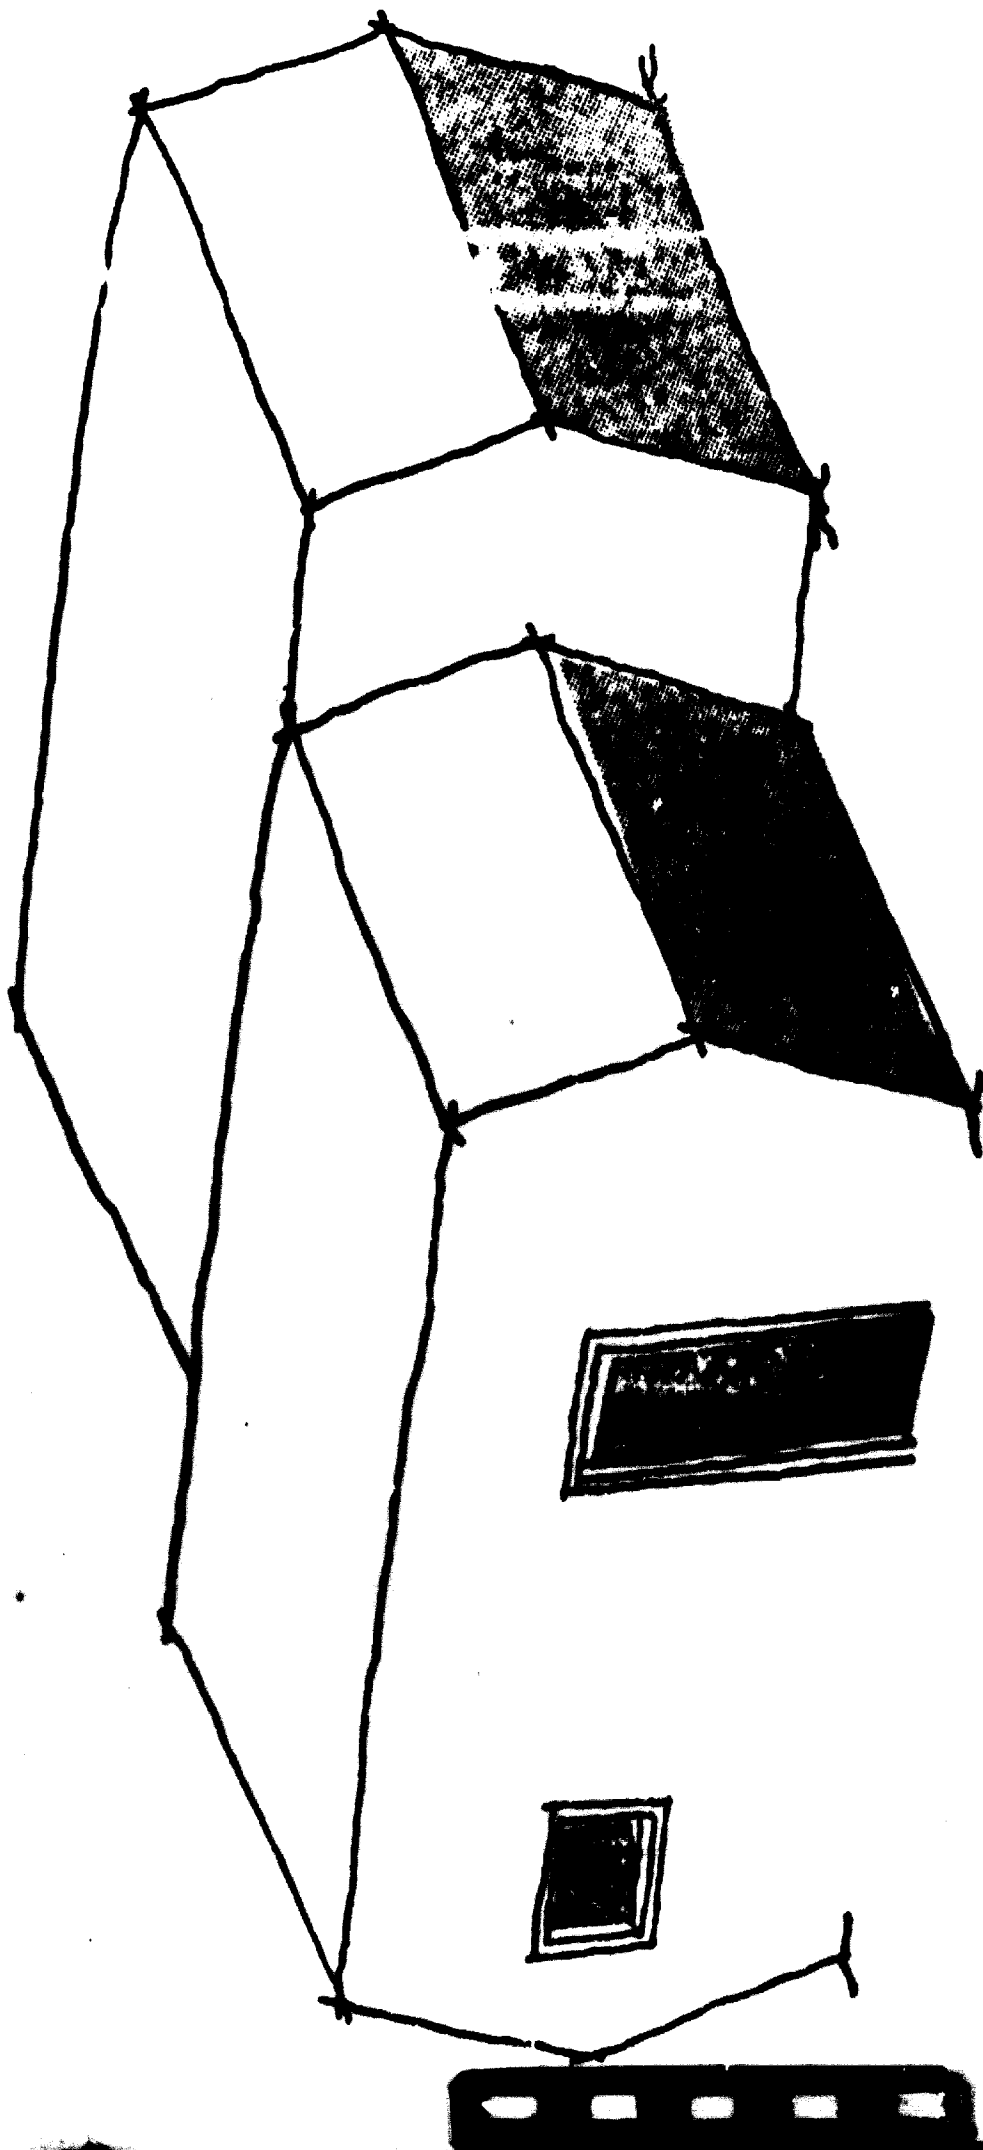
COLLAPSIBLE HOUSE: A MOULDED SANDWICH CONSTRUCTION - AT ERECTION ON SITE
